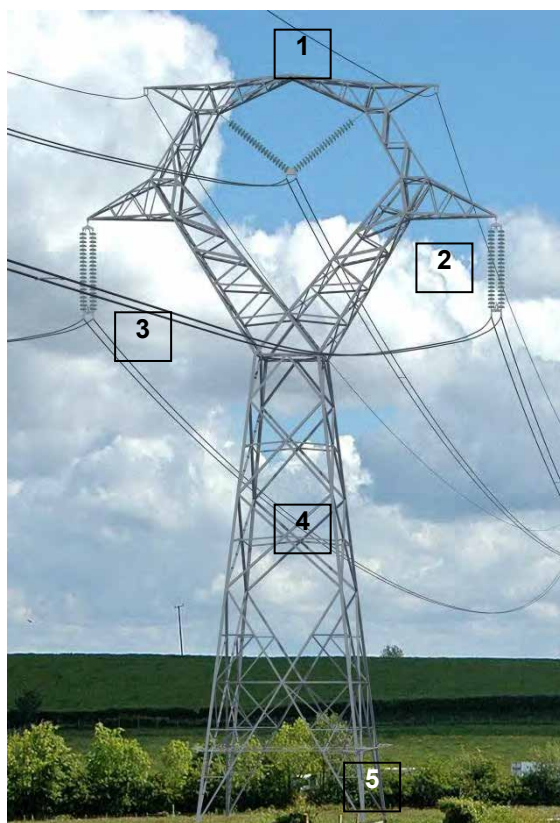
Towers 402 to 410 (along the existing Oldstreet to Woodland 400 kV transmission line)
